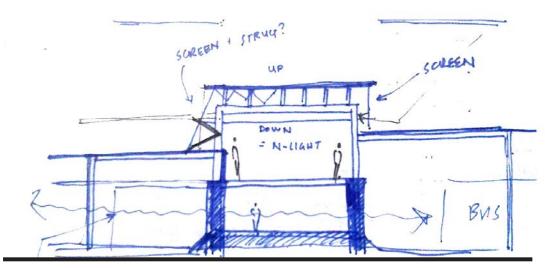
Exploration of natural light through the East/West facades, framed by a lighter steel structure as opposed to the central heavy concrete columns of the public spine
